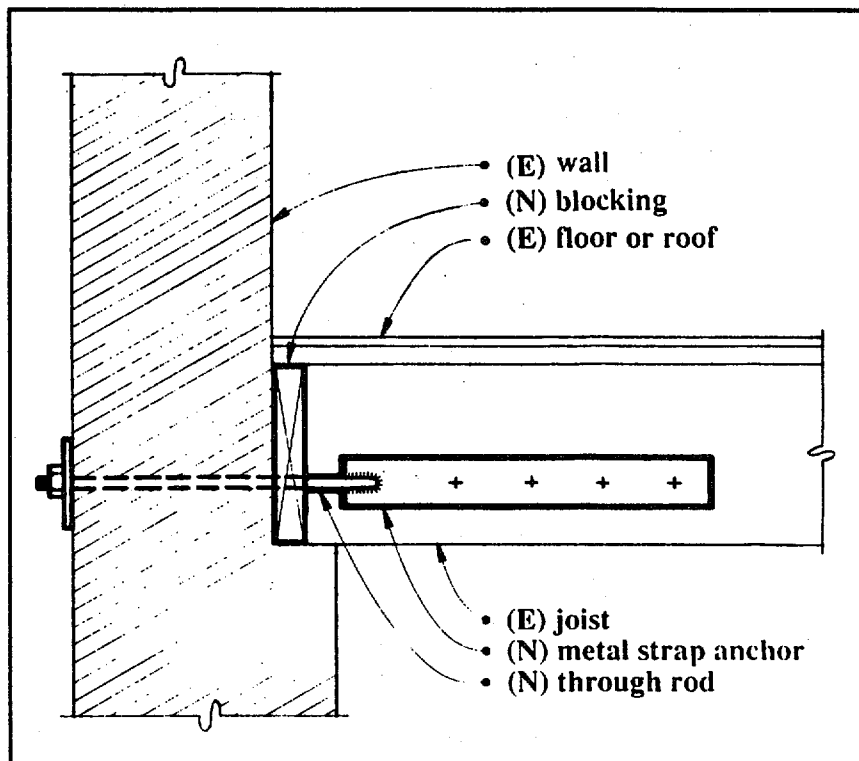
Strengthening out-of-plane connections of a wood diaphragm.
